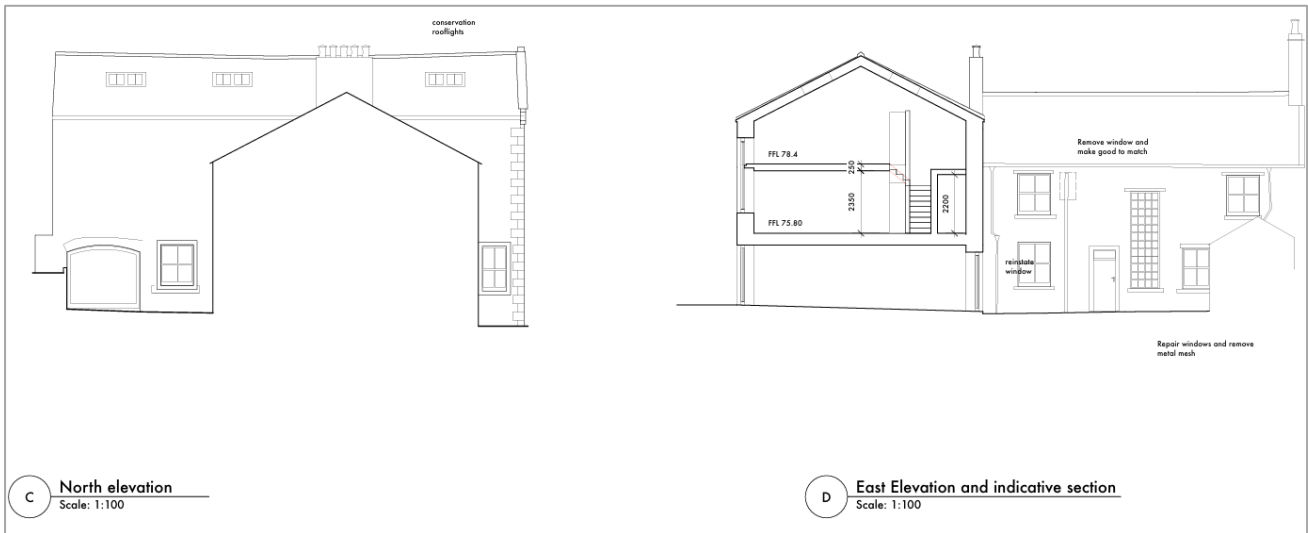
Proposed northern and eastern elevations including indicative section through no.47
